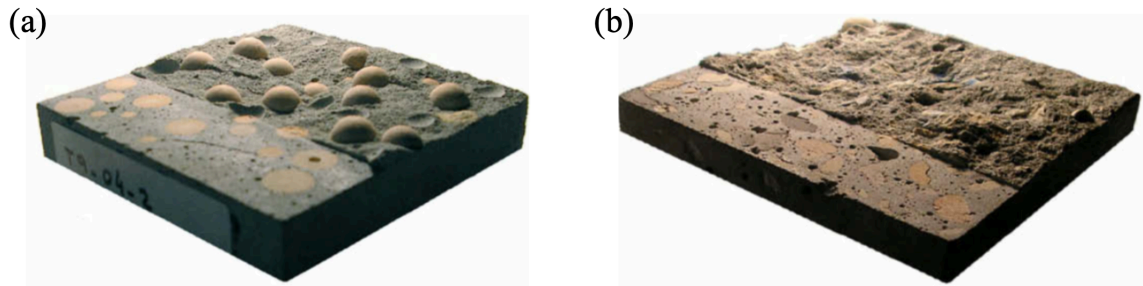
Fracture Surfaces of: (a) spherical aggregates; and (b) crushed aggregates (Rocco and Elices, 2009)
